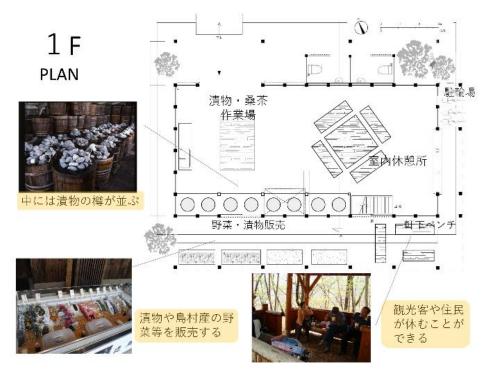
Proposed ground floor plan of 'sanshitsu factory'.
